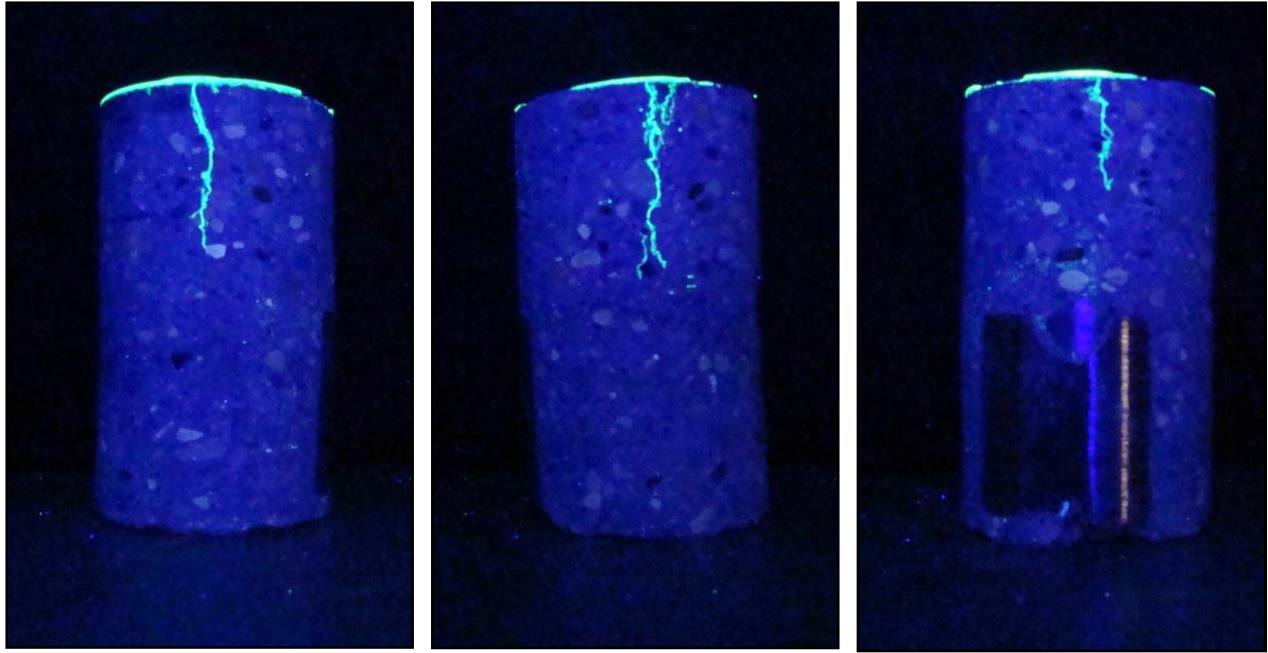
Core LS2 (left) north elevation; (middle) south elevation; (right) west elevation
